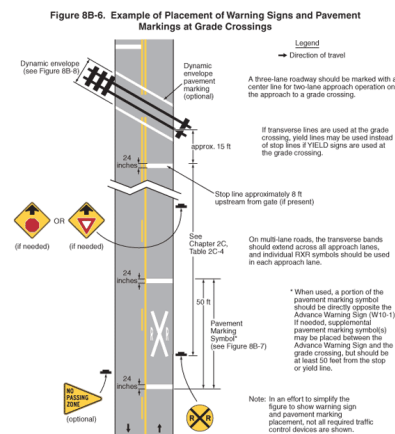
B-6. Example of Placement of Warning Signs and Pavement Markings at Grade Crossings
